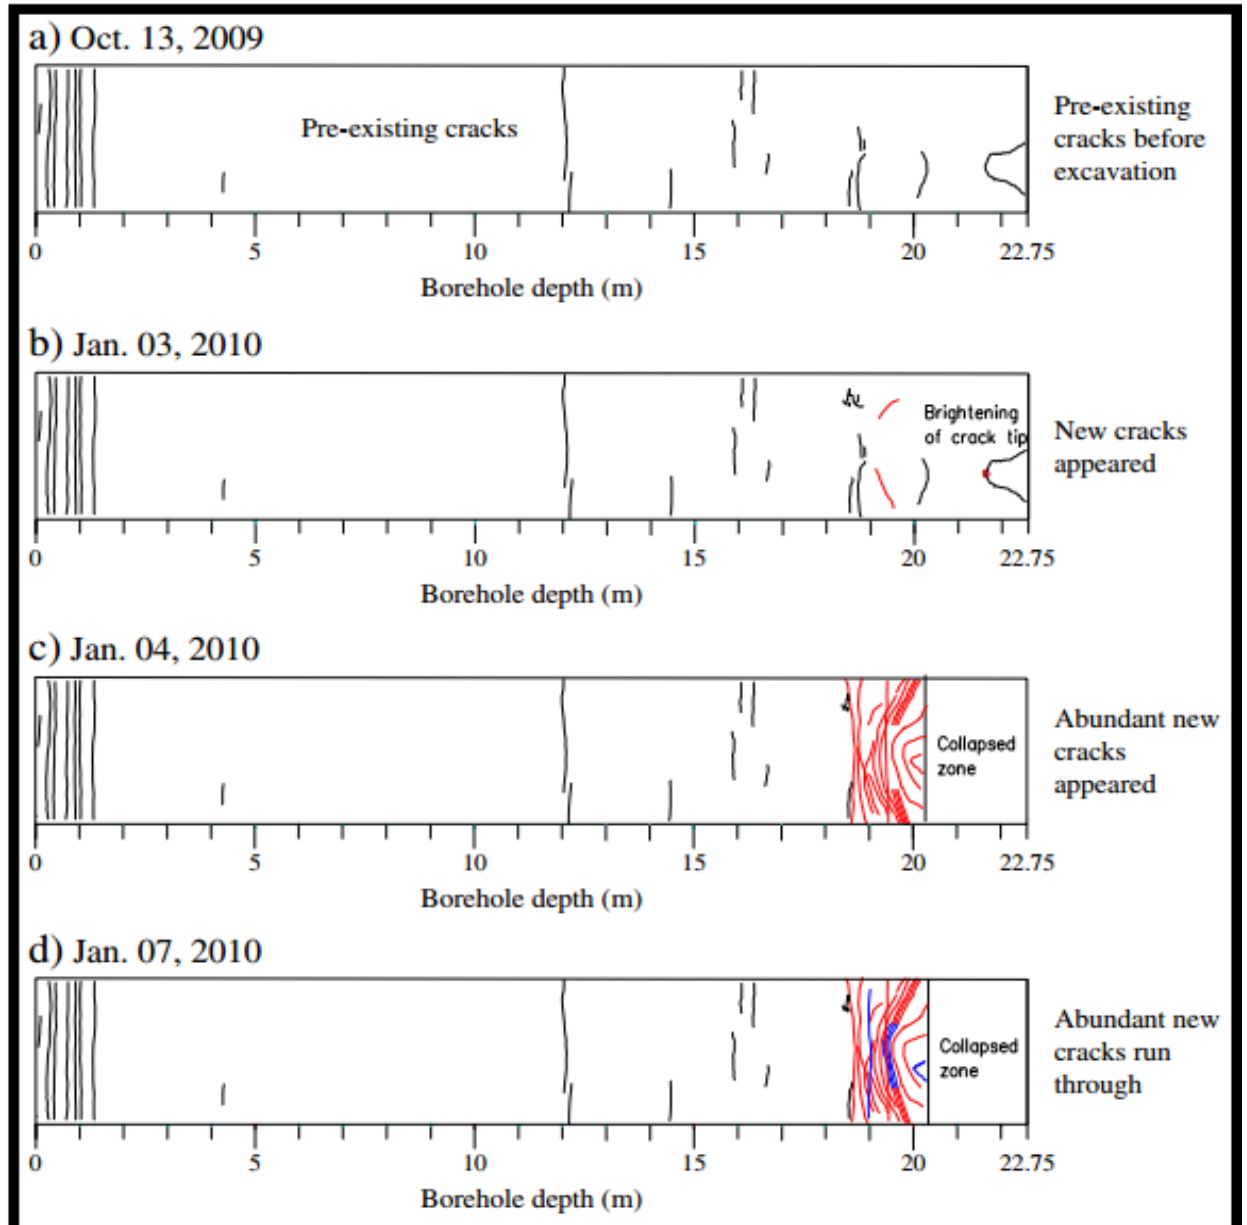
Sketch plan of crack development measured at different times: a) before excavation; b) excavation of top heading of test tunnel F complete; c) 10.0 m of bench excavated, before rock-burst; (d) 21.0 m of bench excavated, before rock-burst (Li et al, 2012).
